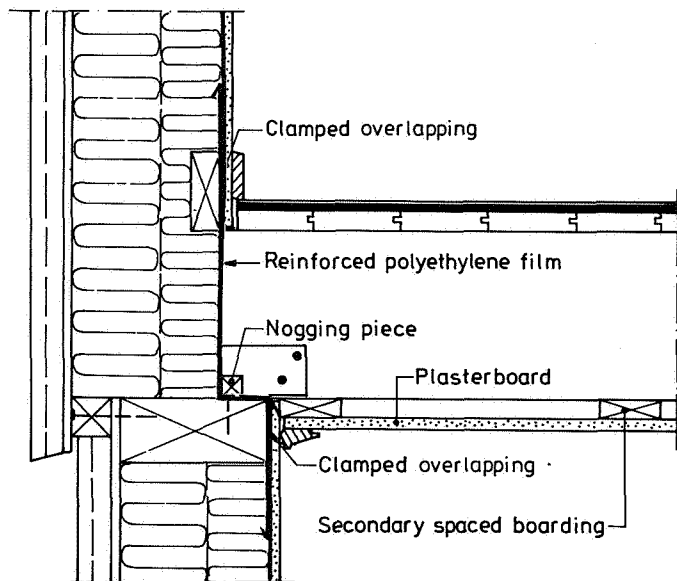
Joint between outer wall (facade wall) and intermediate joist structure.
